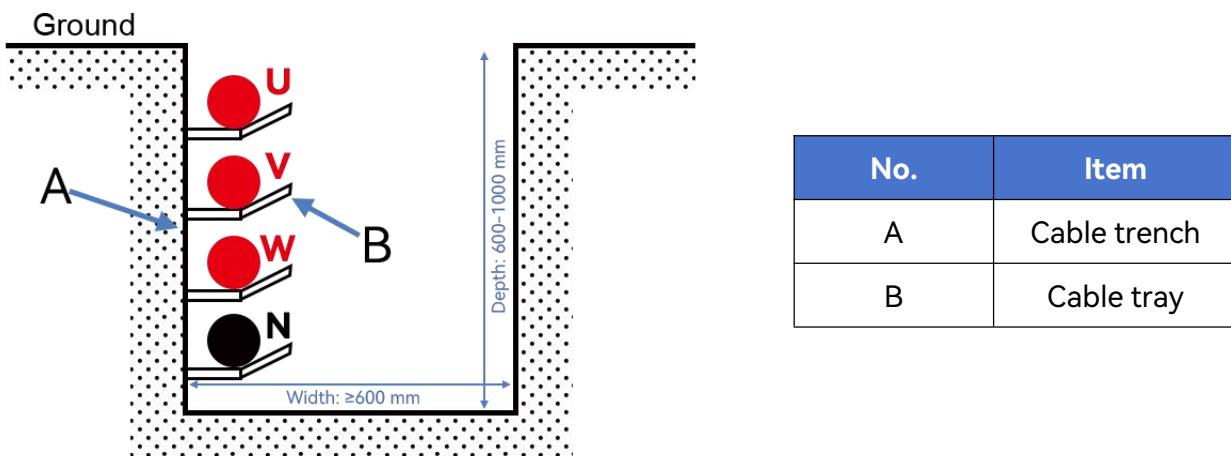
Cable Trunking & Minimum Size of Cable Trench
